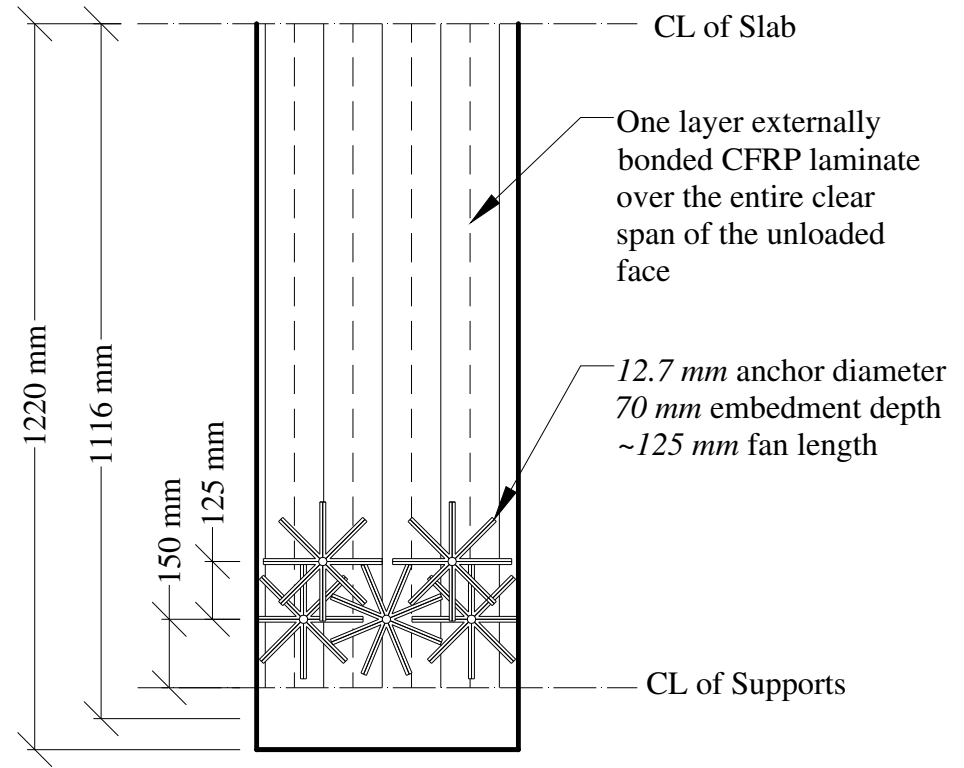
Reinforcement Details for Two-way Reinforced Concrete Slab Plates.
